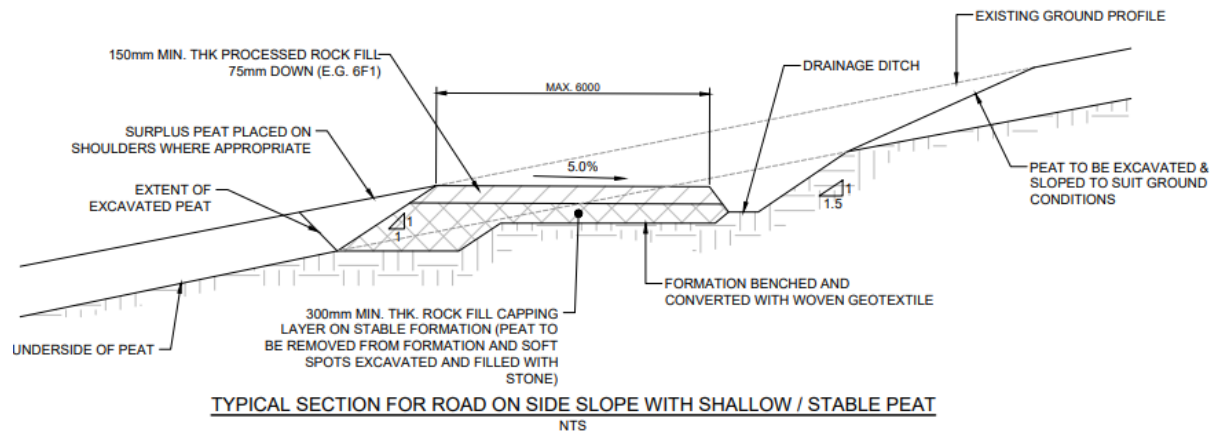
Technical drawing of proposed typical section through road in areas of shallow peat
